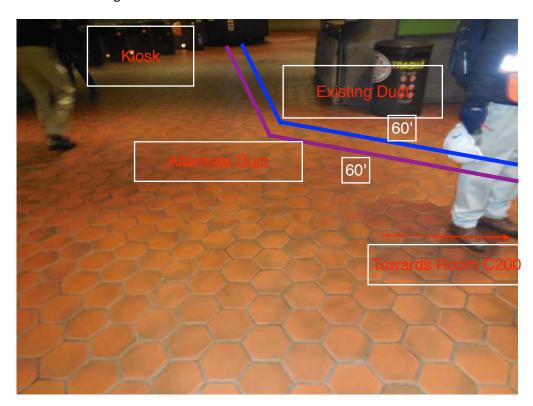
Existing and alternate duct runs on mezzanine floor.
